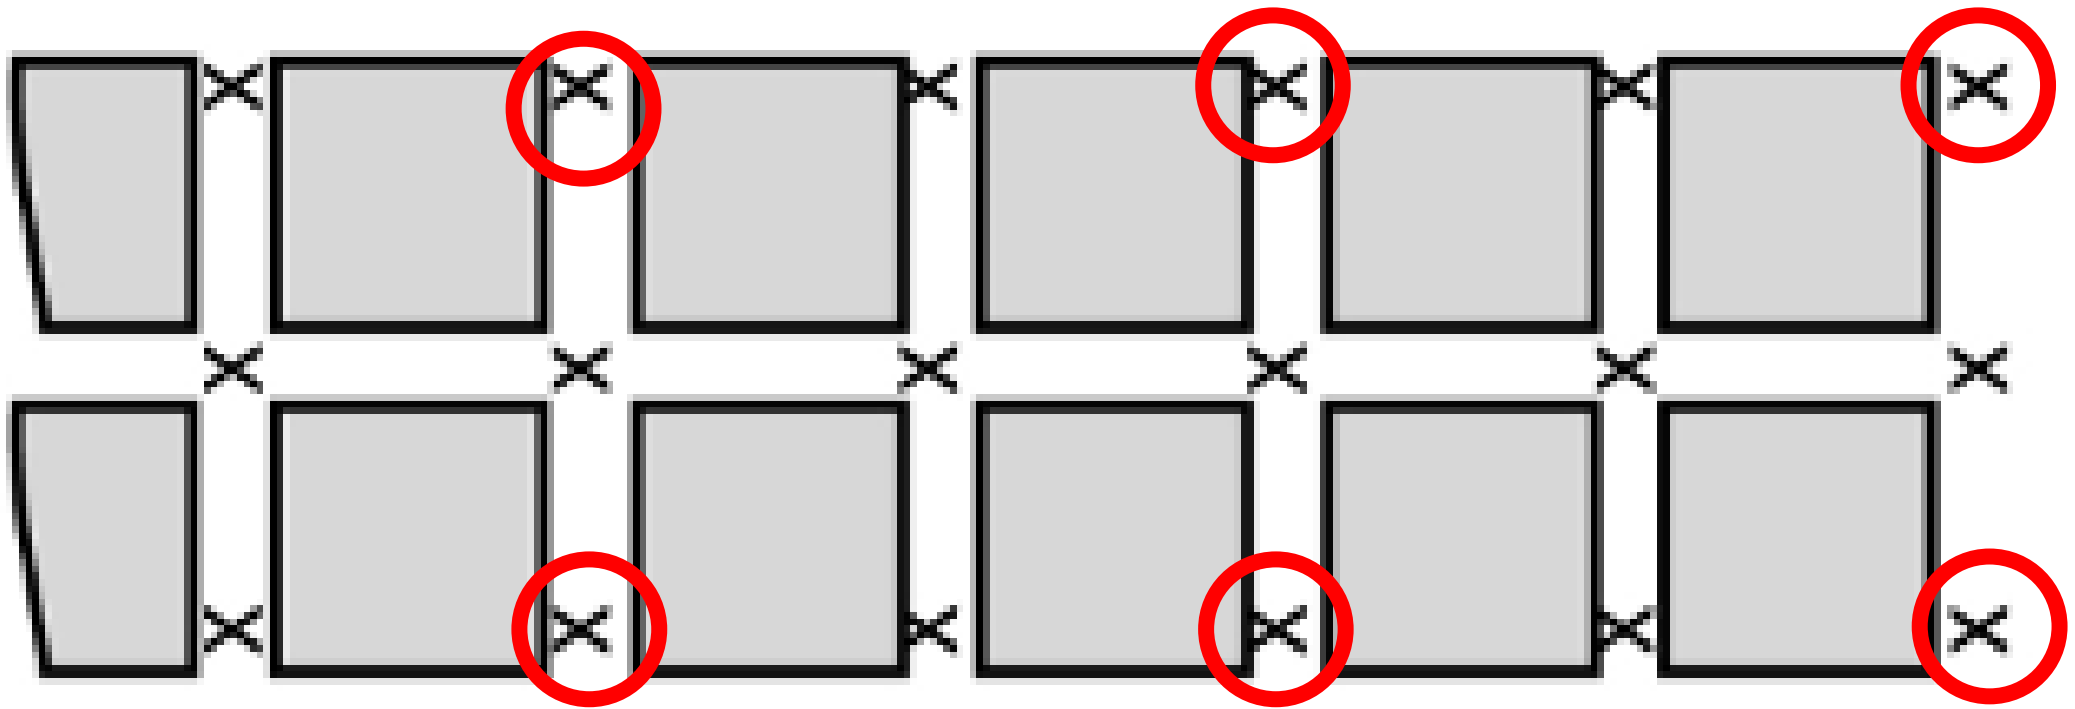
(e) Plan View of In-Rack Sprinkler Arrangement for Open Double-Row Racks Up to 12 ft (3.7 m) Deep.
